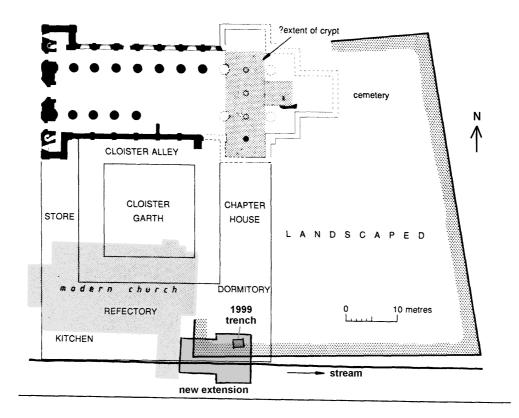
Outline of the priory church with the modern church, showing 1999 evaluation trench and the outline of the church extension, scale 1:750.
